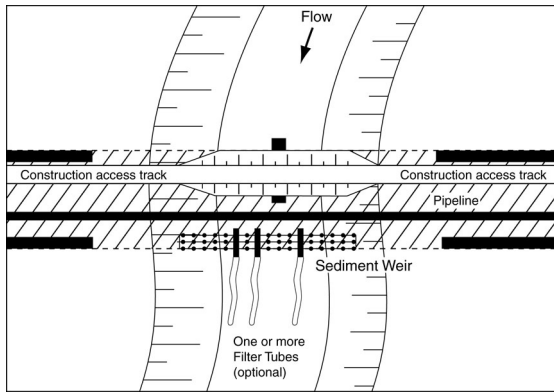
Installation of pipeline. Note part of the bypass pipe may need to be removed to allow pipe installation
